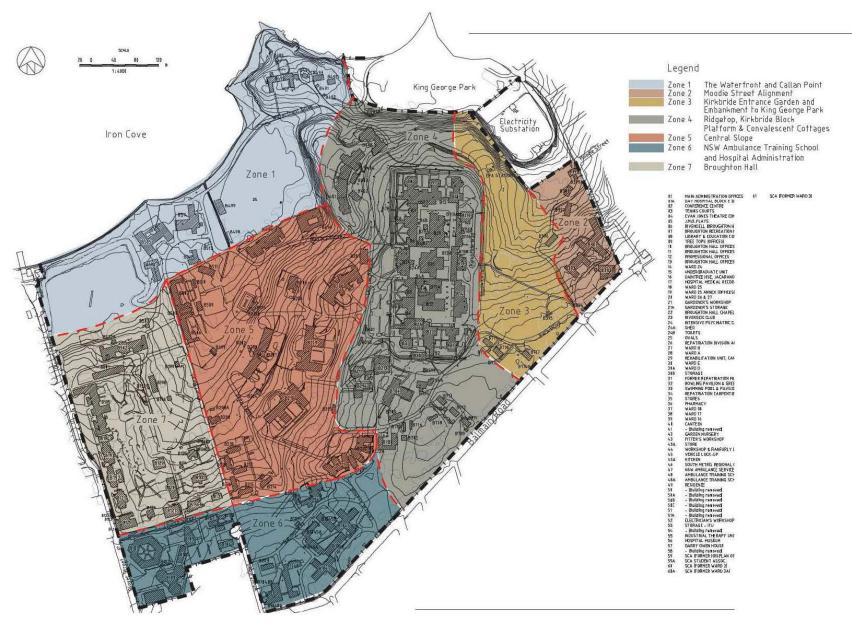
Site Plan with Study Zones (Tanner Architects)
